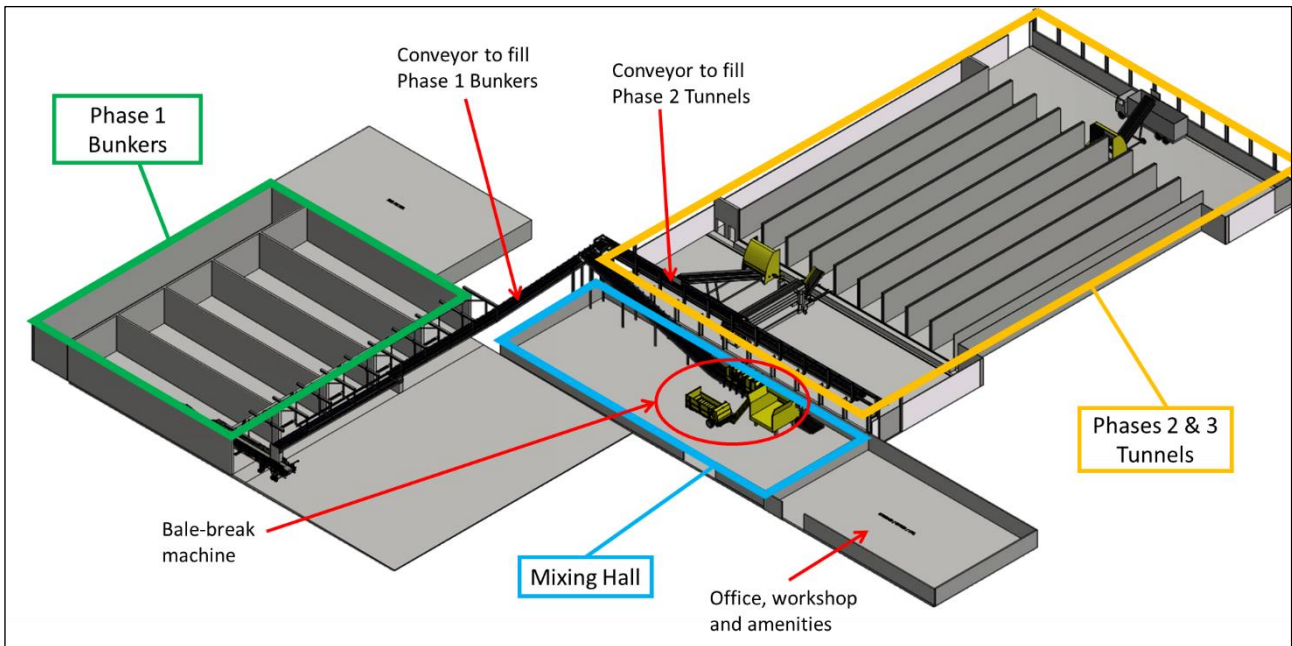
Schematic view of Phase 1 Bunkers, Mixing Hall, and Phase 2 Tunnels.
